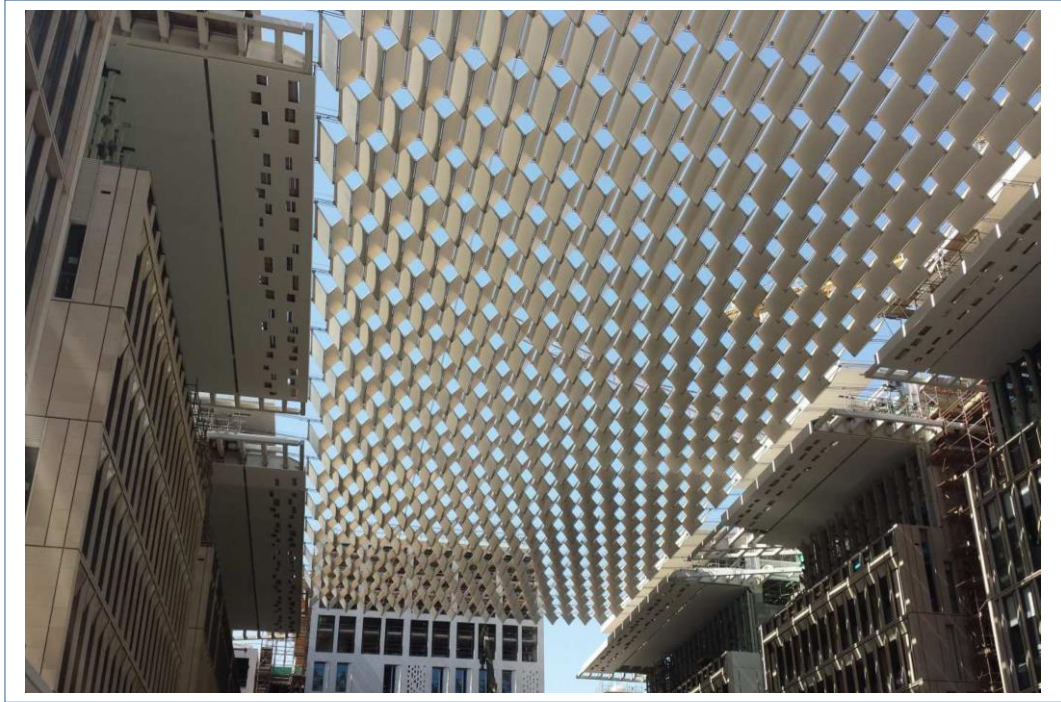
View from Barahat Al Nouq square against un-folded roof structure. (Gregor Grunwald et al-2016-)
